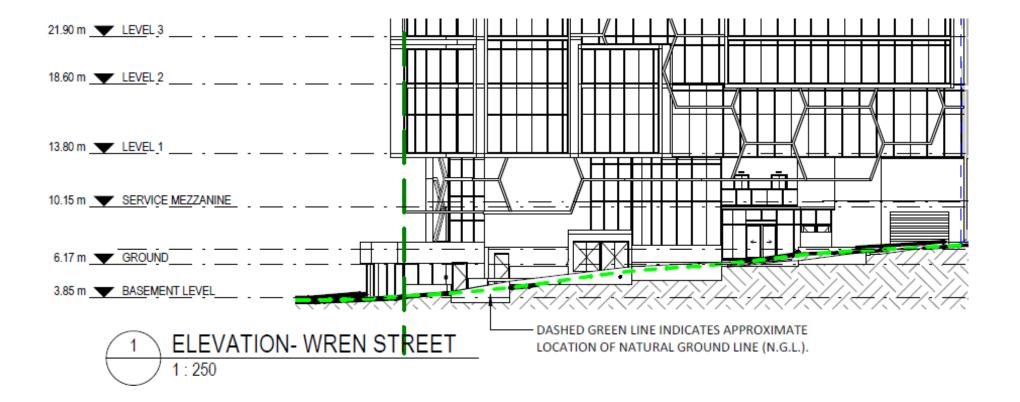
Wren Street Elevation & proposed Floor Levels (Source: Thomson Adsett)
